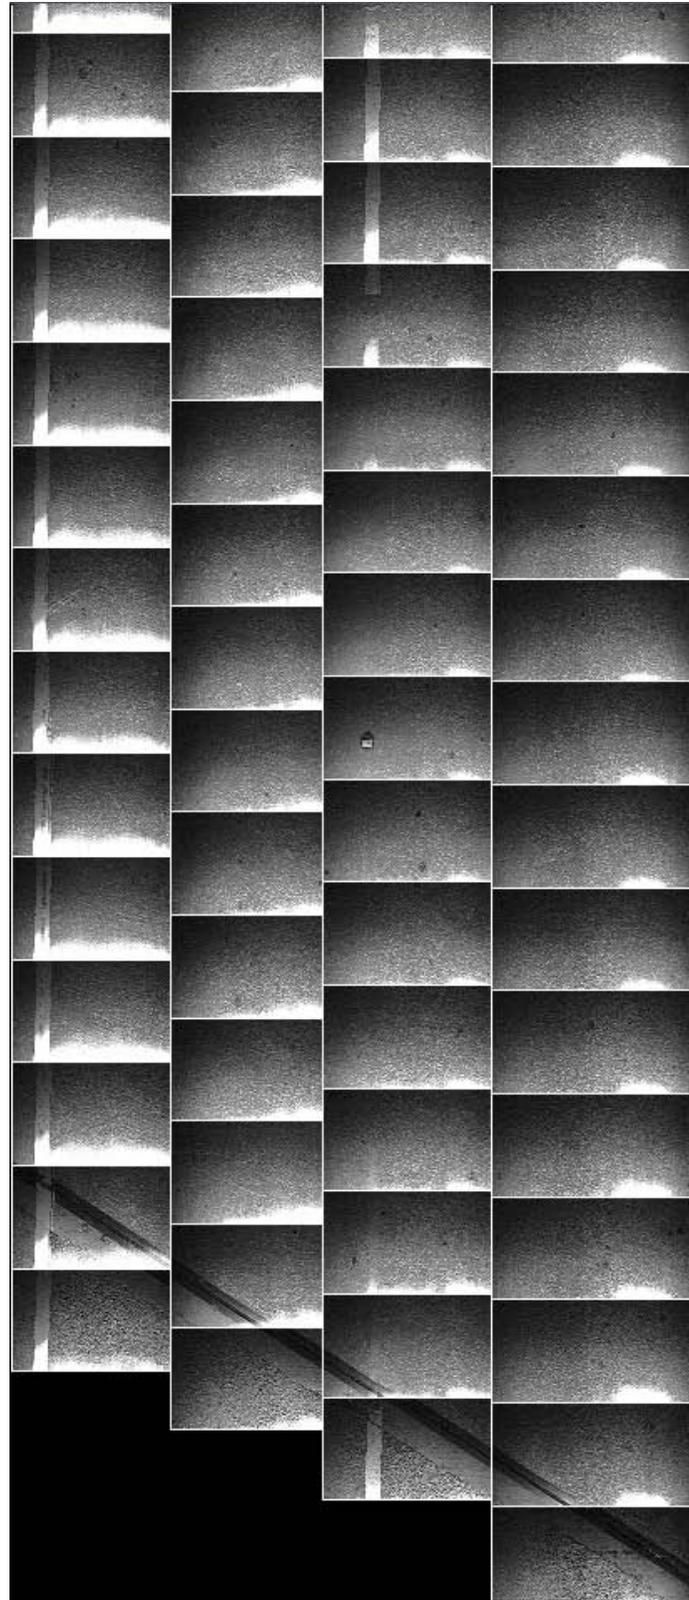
Results on Bridge # 100377 Gibsonton Rd EB over I-75
